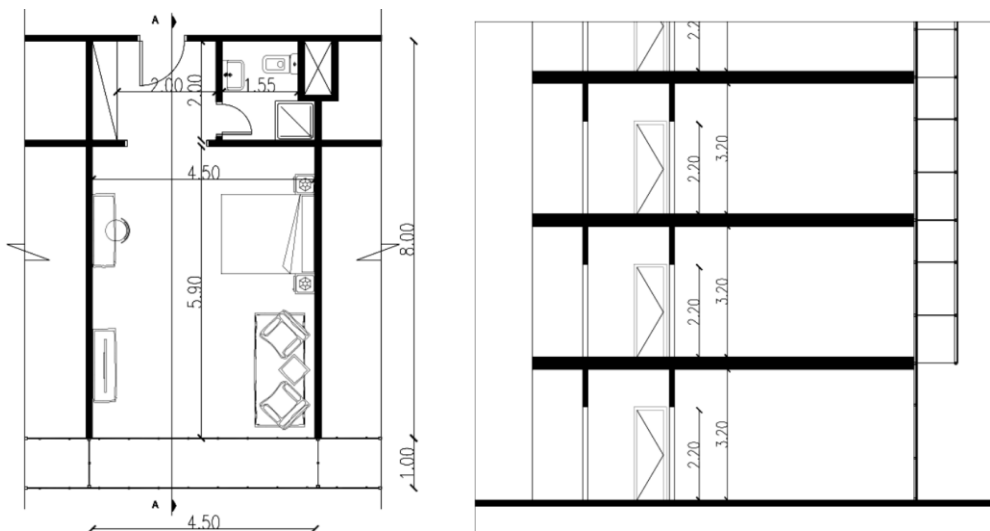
Plan of Naturally Ventilated Wall Case (Left) and Section (A-A) Passing through Plan (Right)
